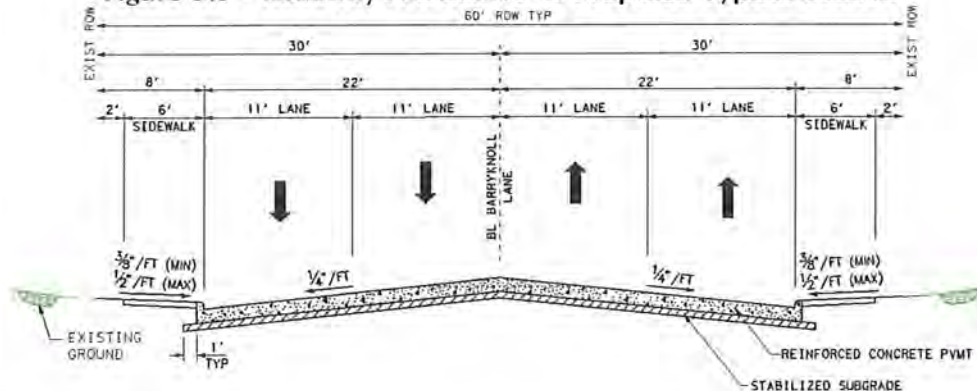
Roadway Alternative 3: Proposed Barryknoll Lane near Gessner Road
